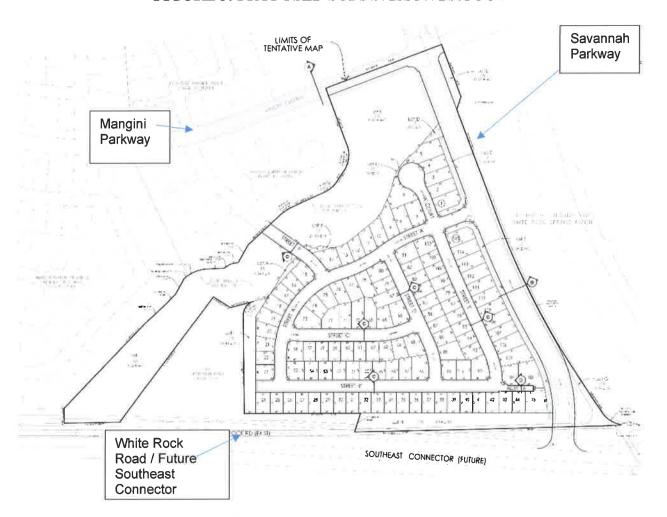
PROPOSED SUBDIVISION LAYOUT
